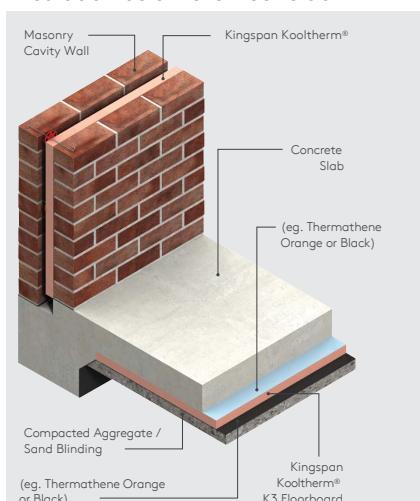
Solid residential concrete slab on ground floor with Kooltherm® K3 Floorboard below the floor slab.
